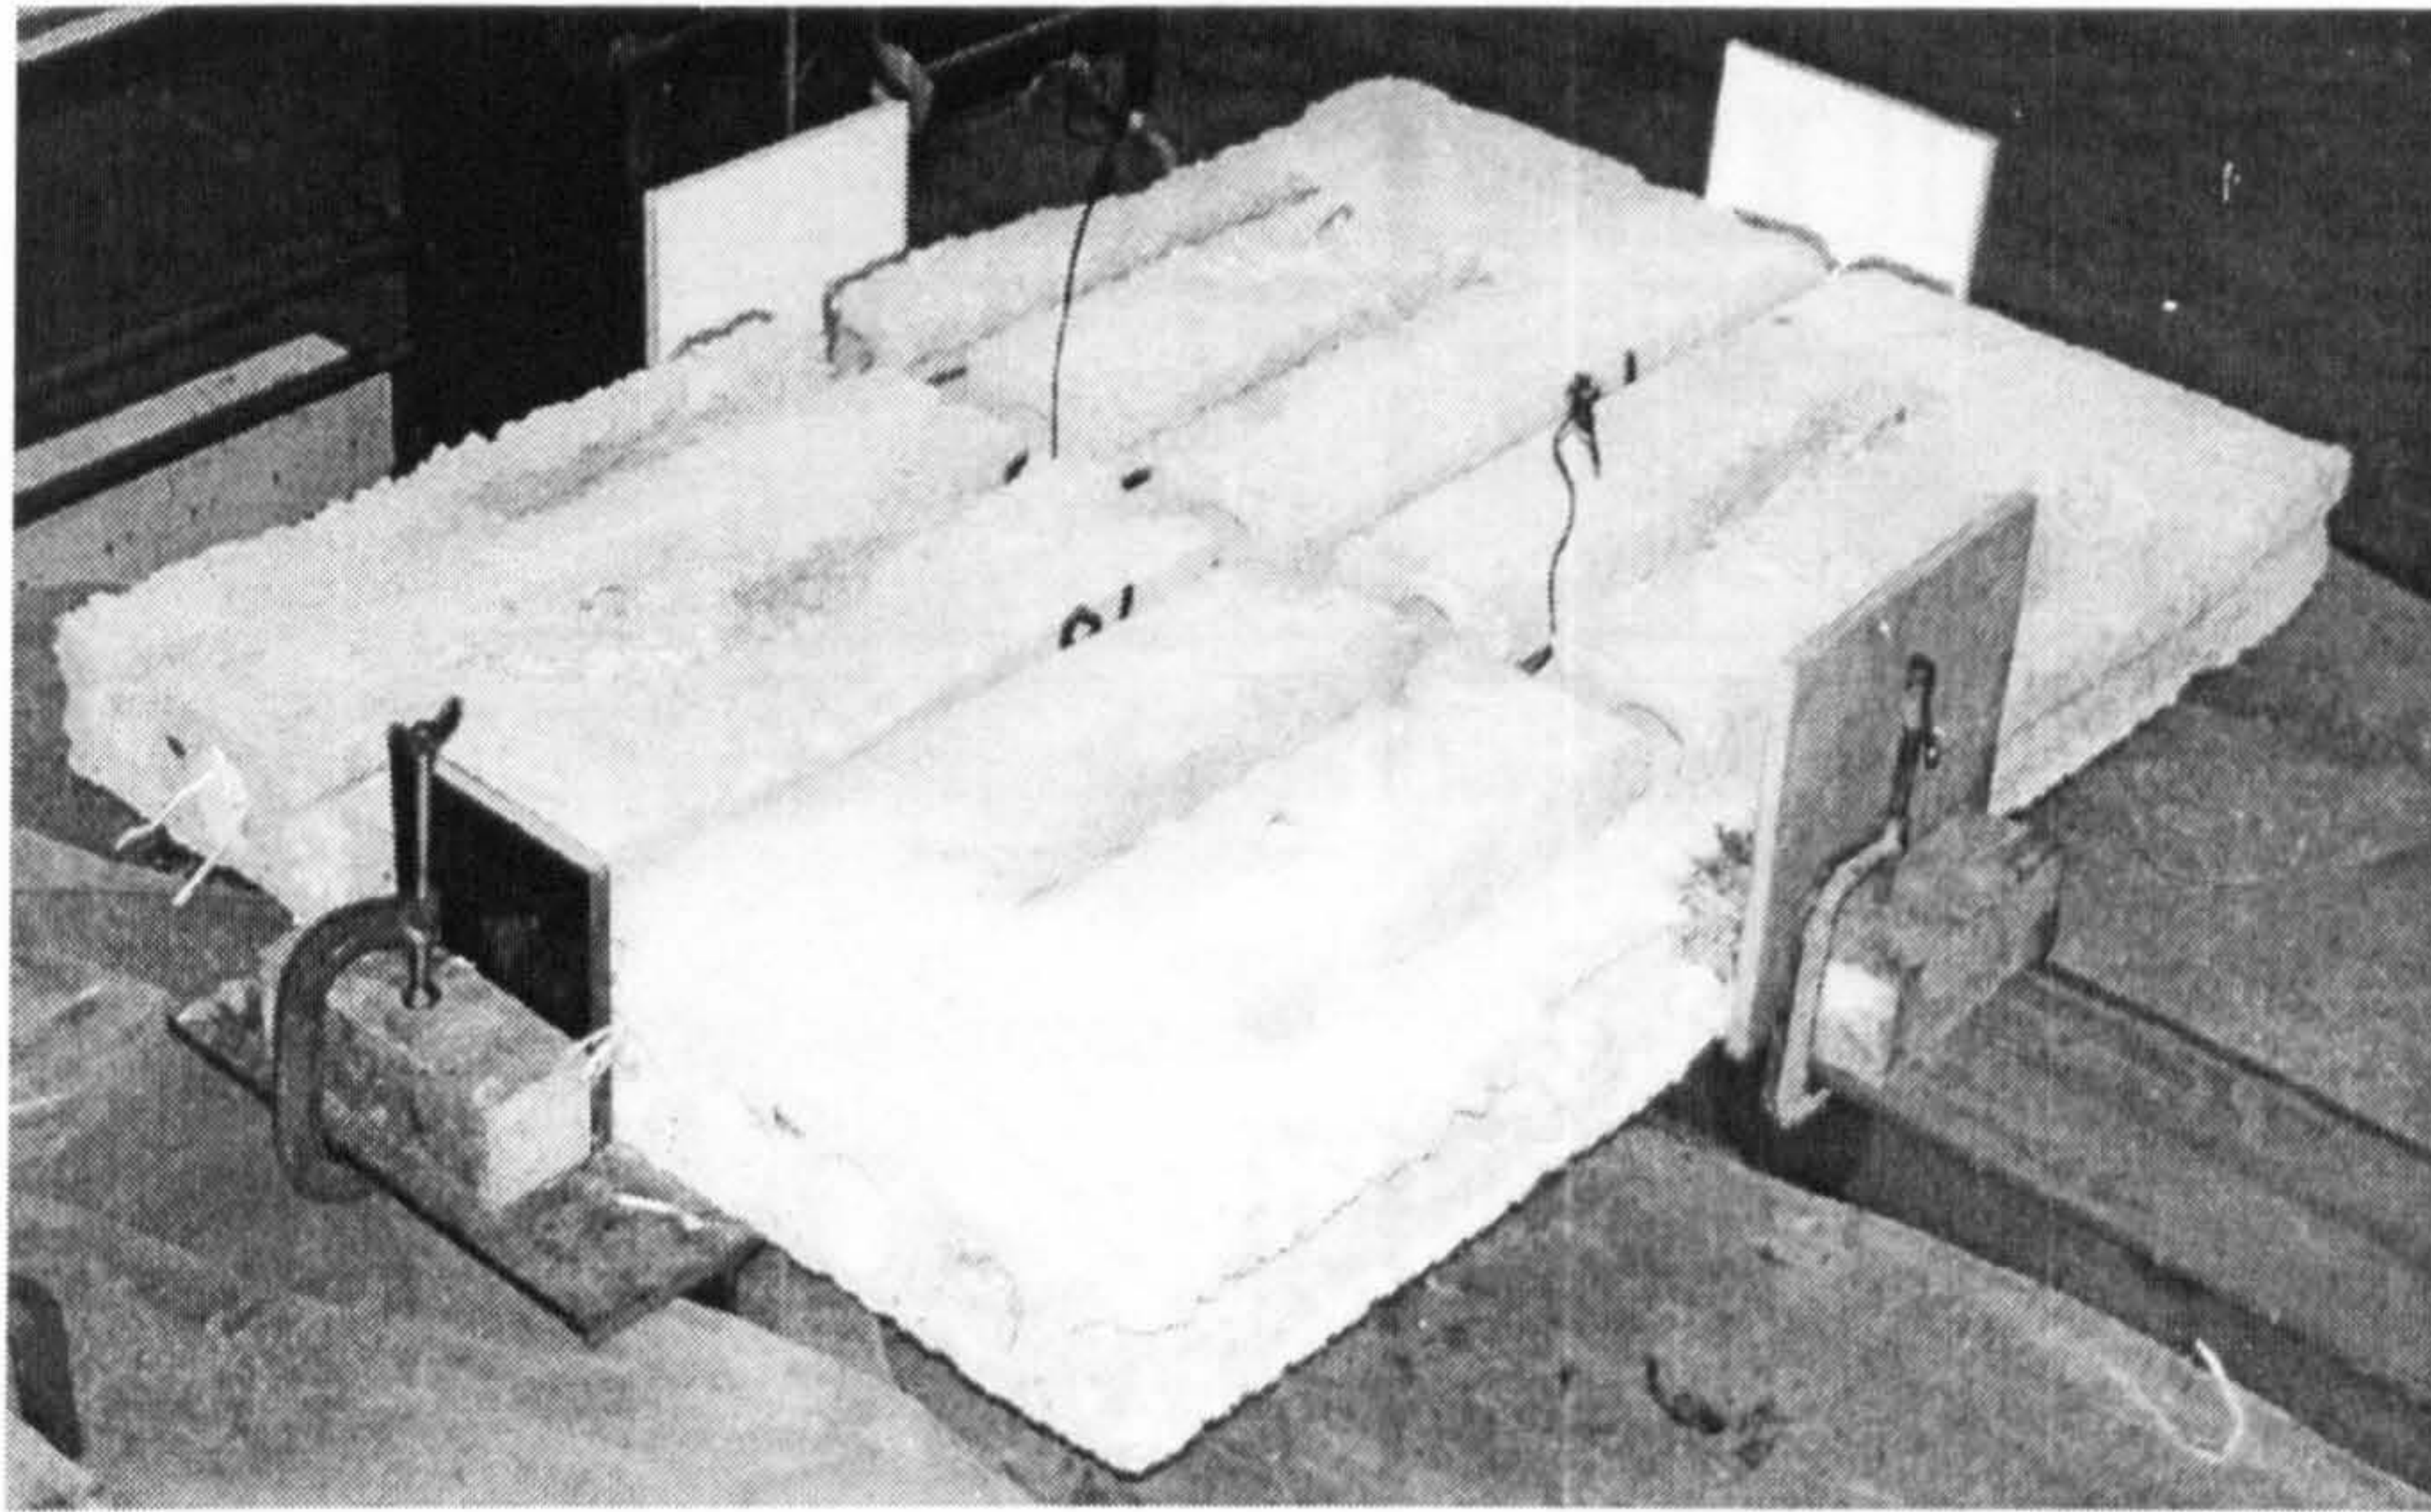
General arrangement of test specimen before casting of in-situ concrete
